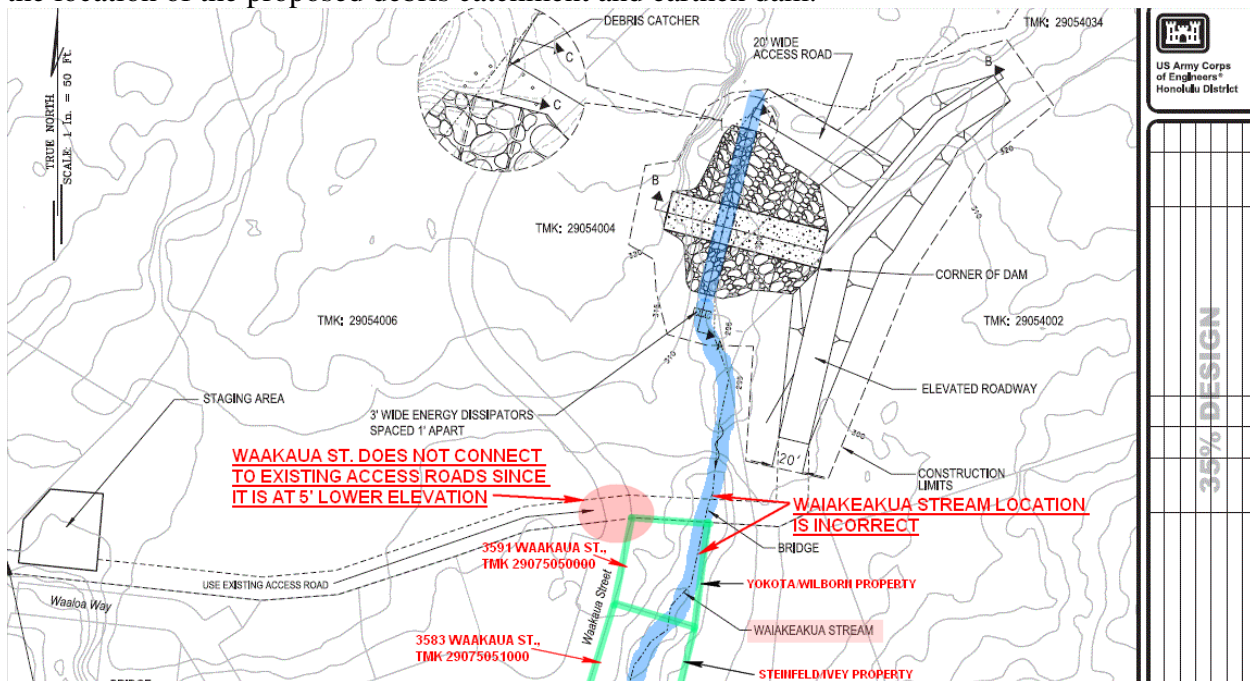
Partial Site Plan on Drawing #C-302 from Section A2 of Appendix A
